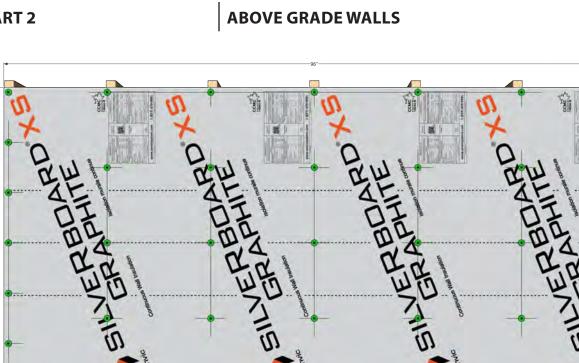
Horizontal nailing pattern at 16" (406mm) o.c. studs (42 cap nails)
